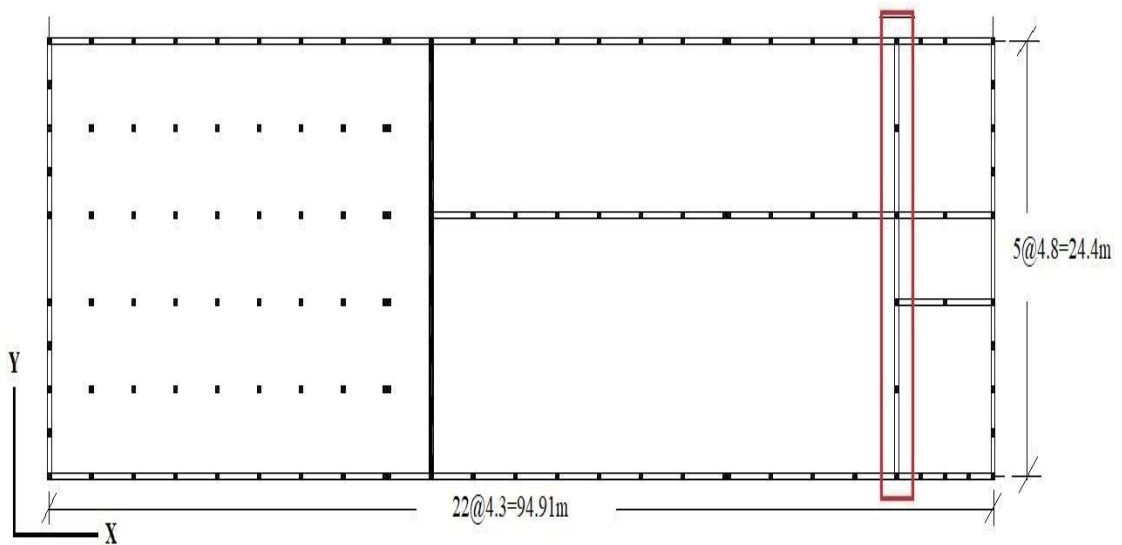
Foundation plan of the building and, highlighted, the frame selected for analysis
